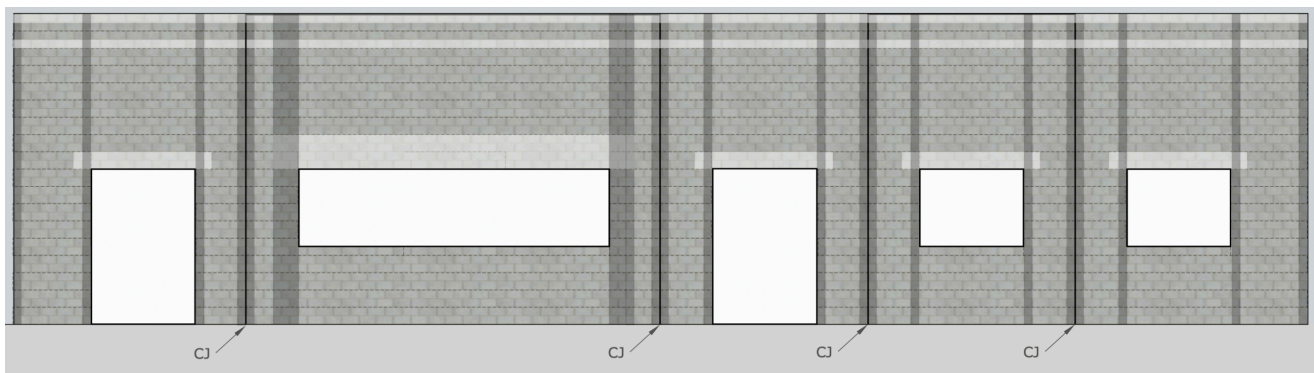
Arrangement of Control Joints Away from Openings in Reinforced Walls
